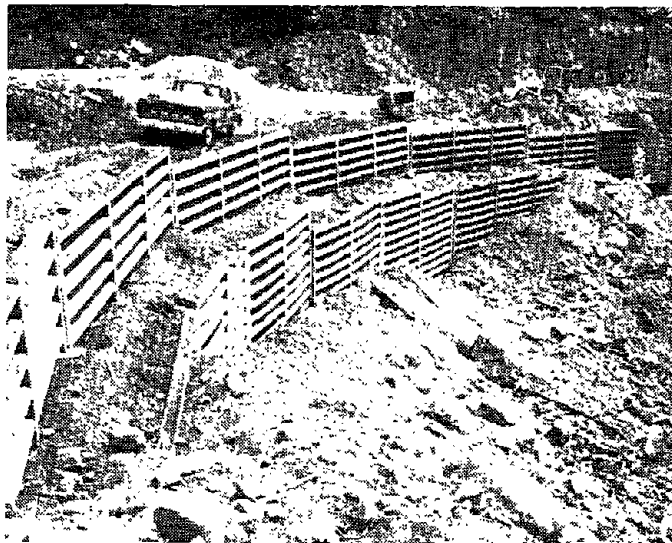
through 2-12 shows examples of circular, rectangular, and cross-tied bins. Steel bins are generally considered standard gravity structures, although cross-tied bins develop a portion of their stability from the tensile forces induced in the tie strap. Typically, steel bins are proprietary designs.
